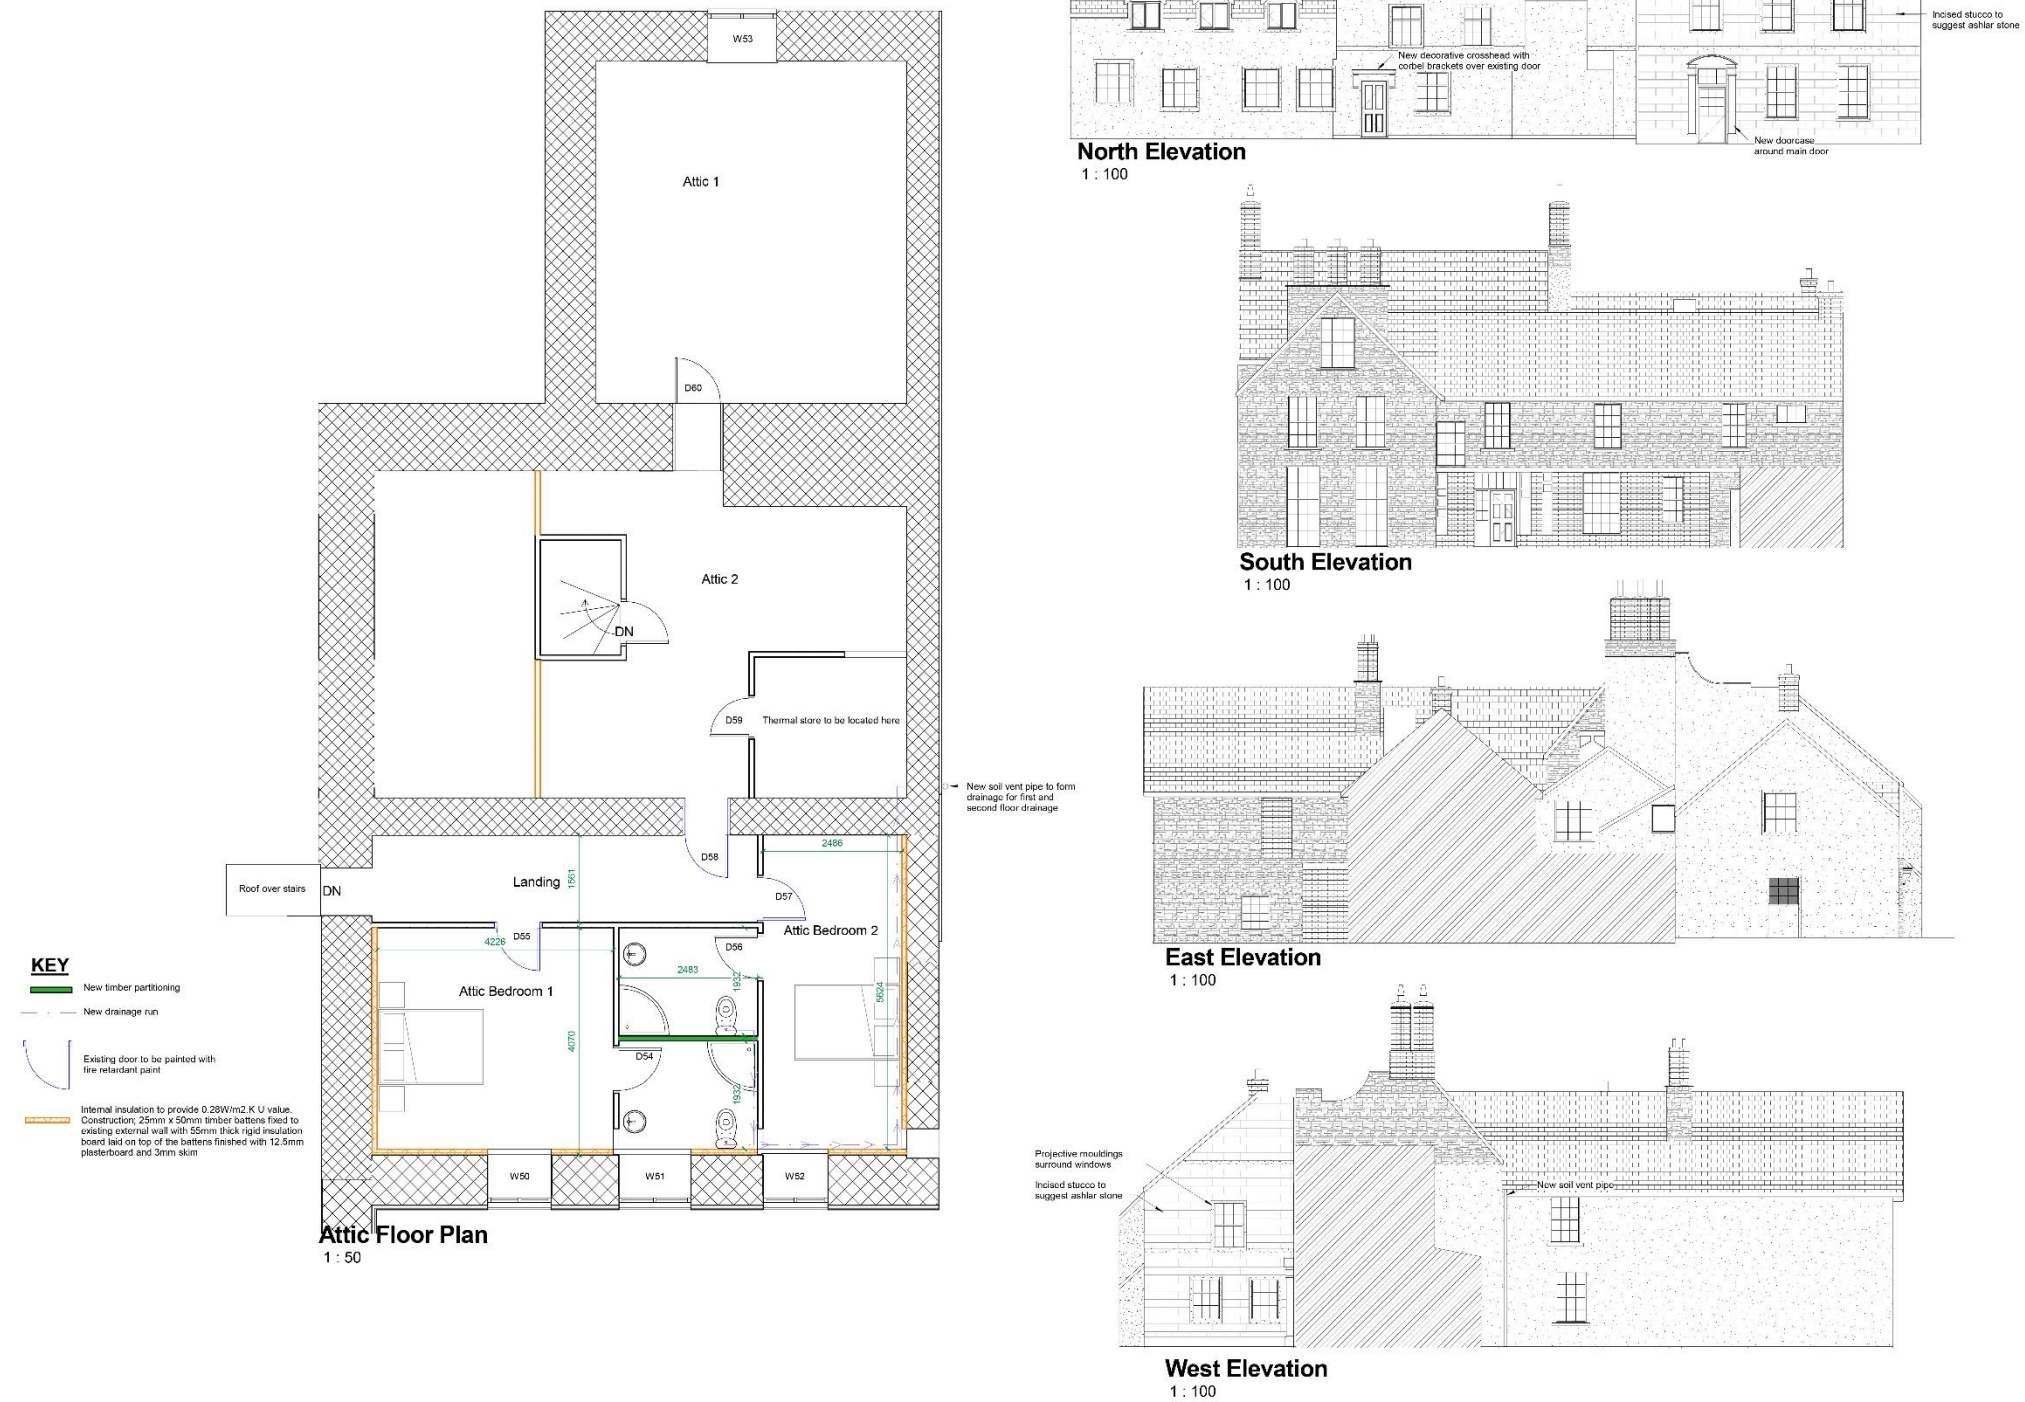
Proposed attic floor alterations (left) and proposed changes to the exterior (right)
